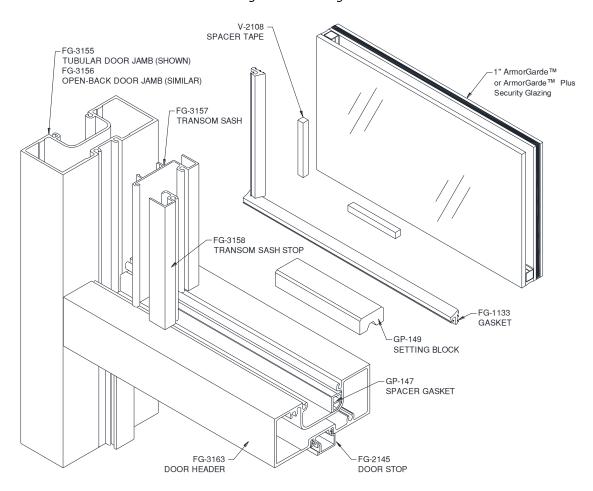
ArmorDefend™ Wet Glaze Assembly at FG-3163 Door Head
